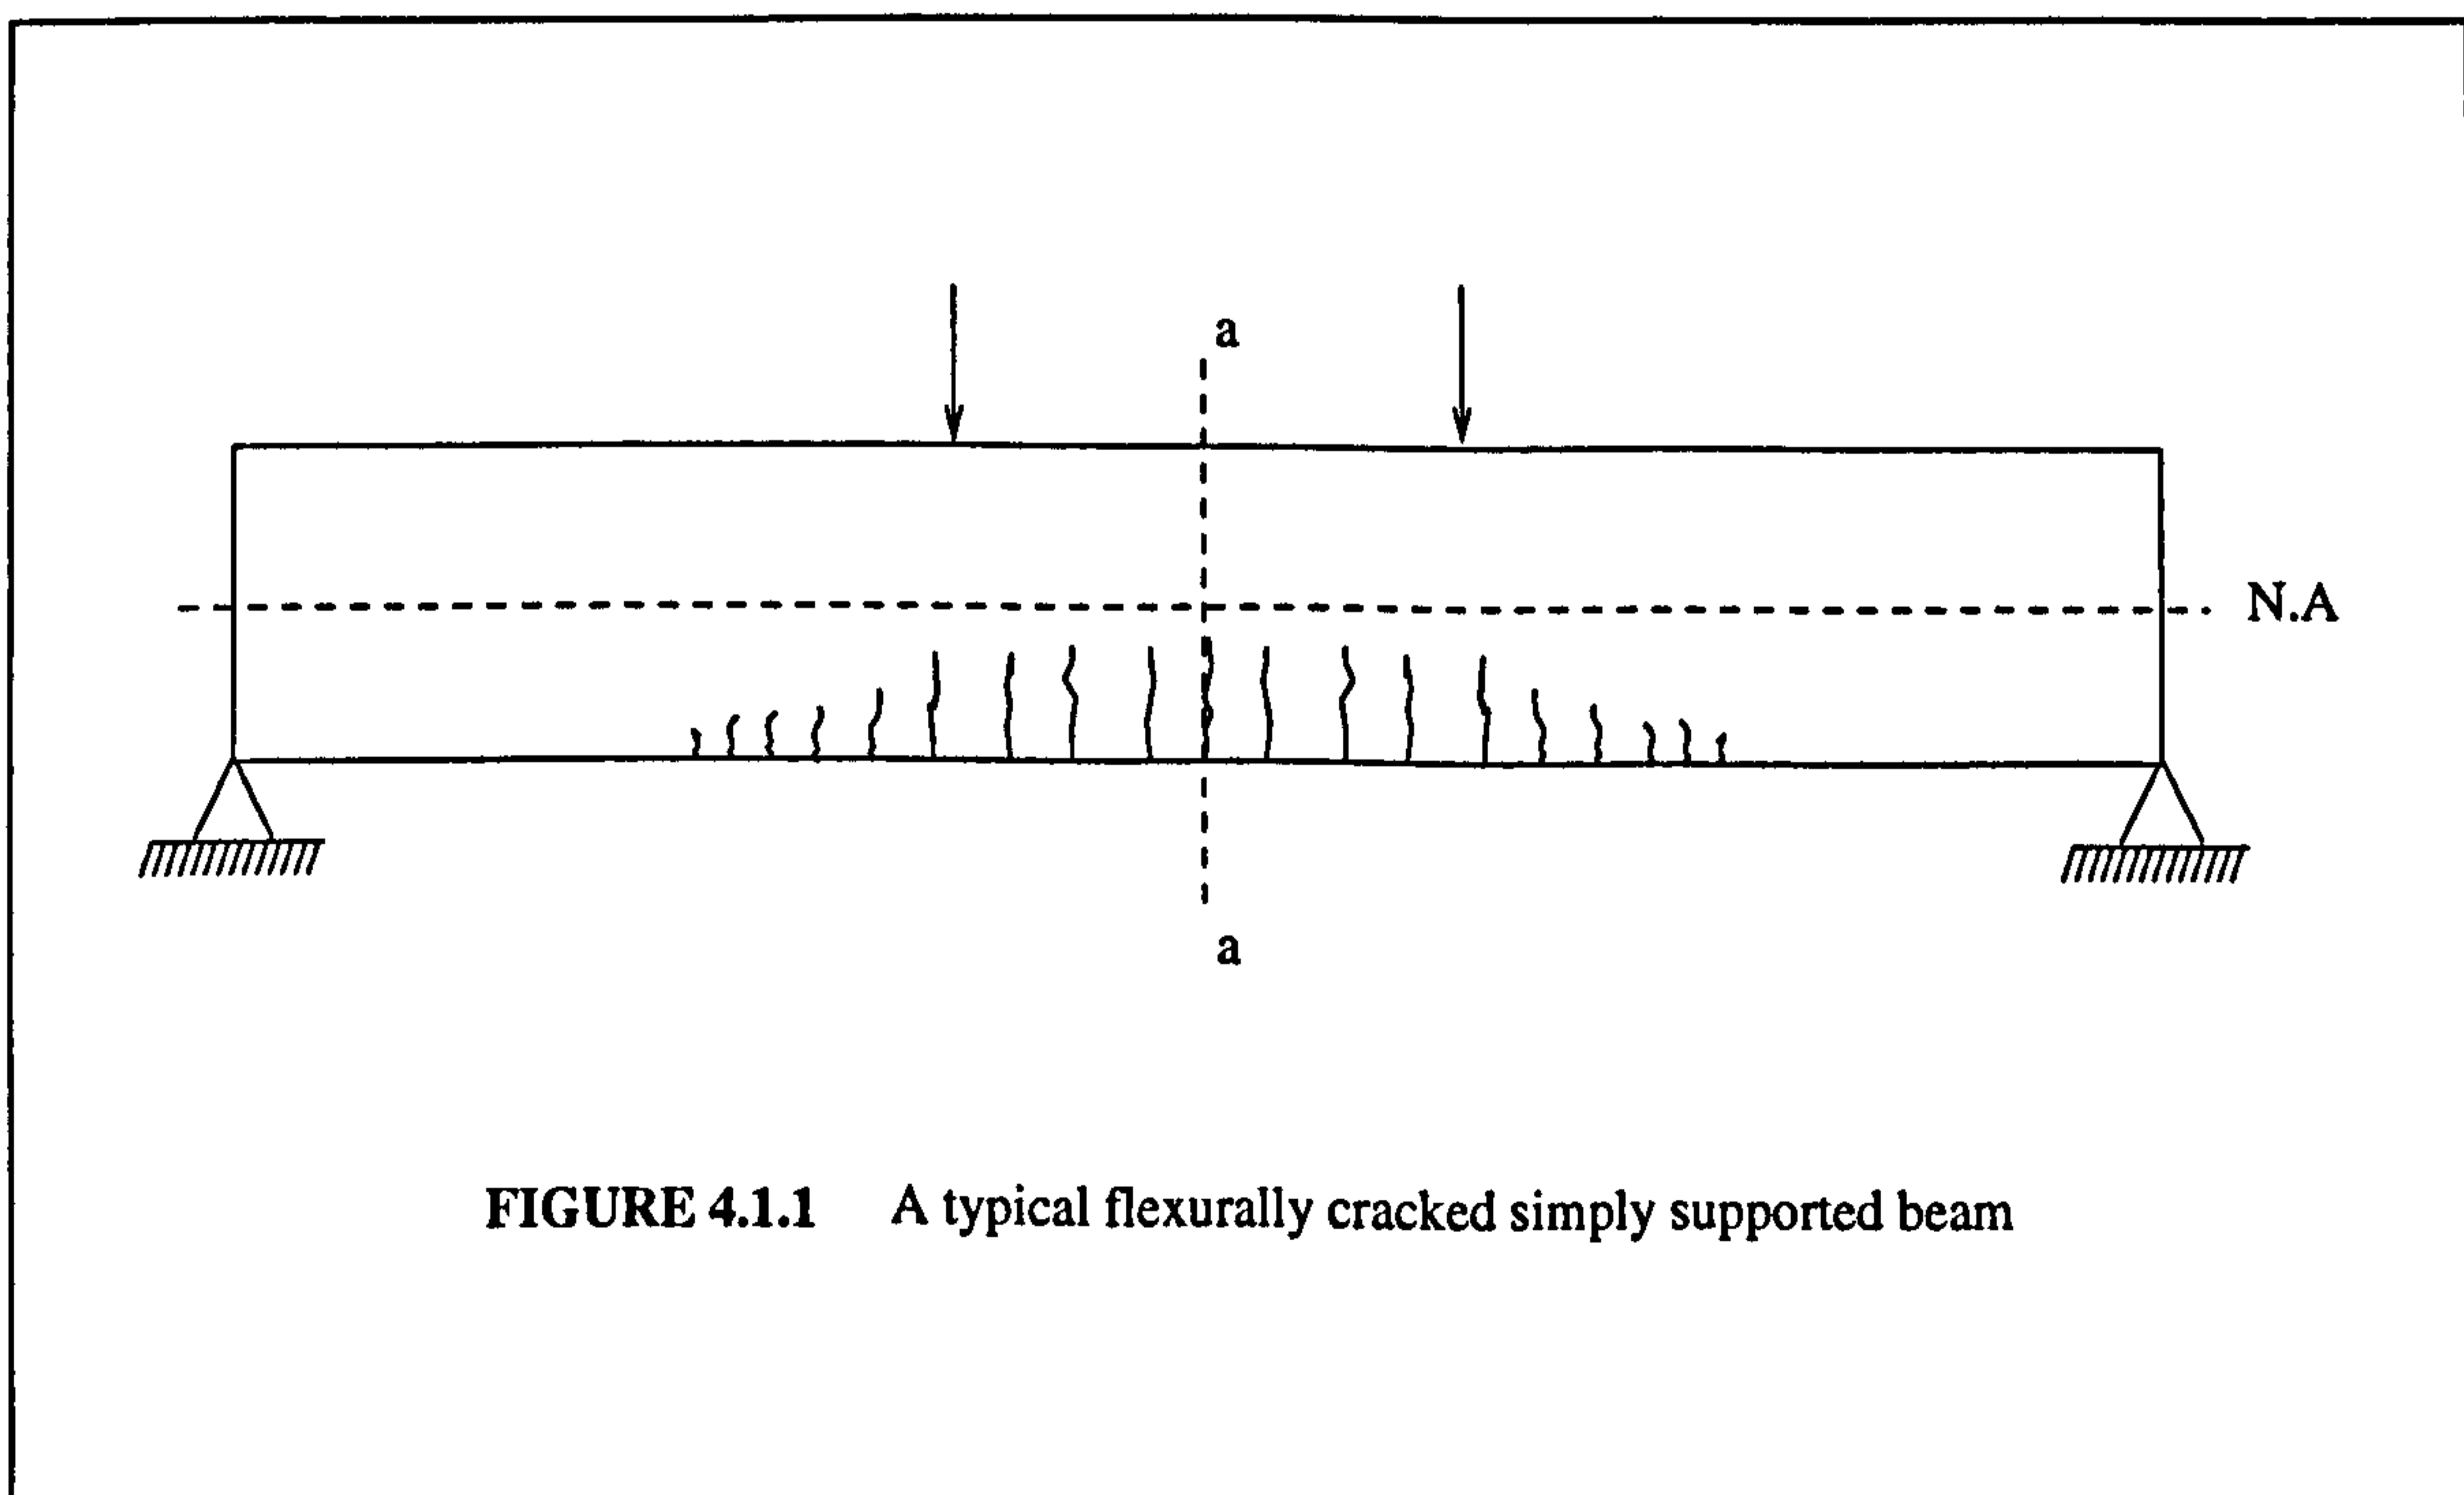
A typical flexurally cracked simply supported beam
